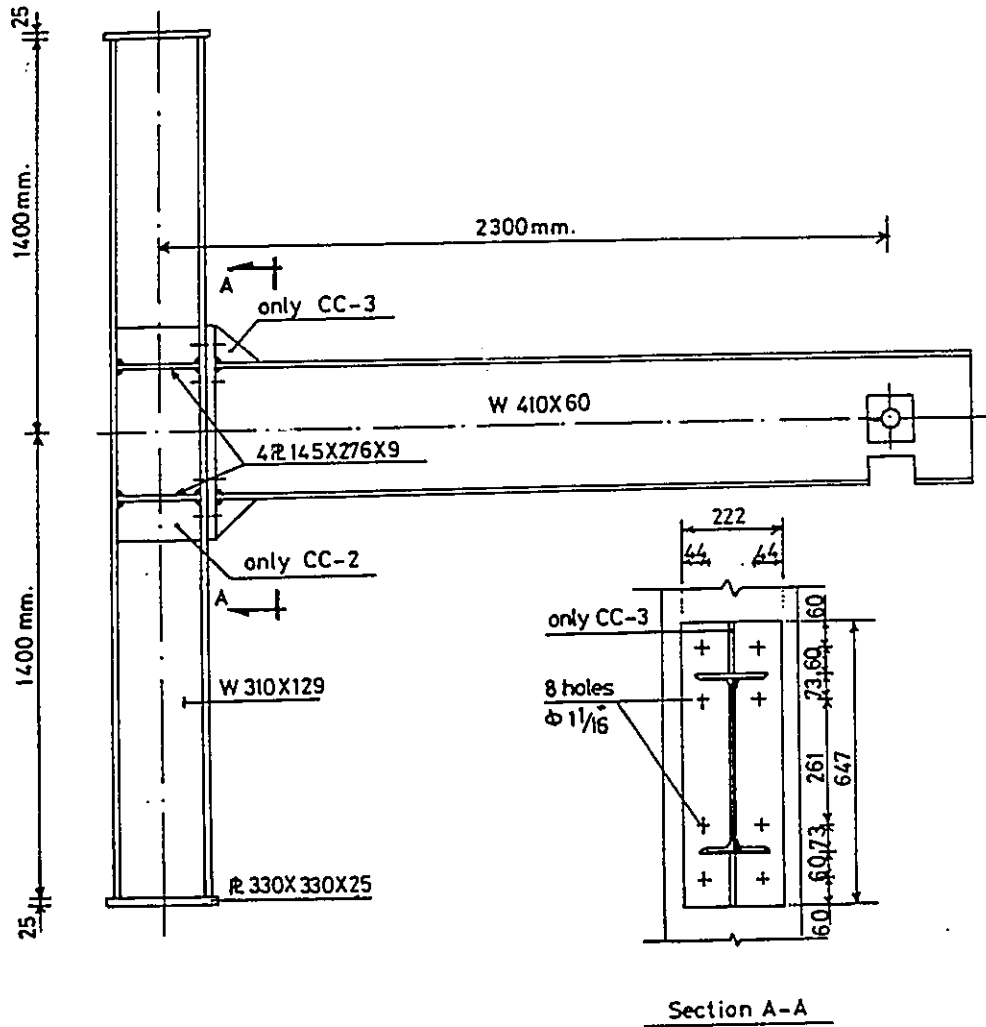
Details of specimen CC-1, CC-2 and CC-3.
